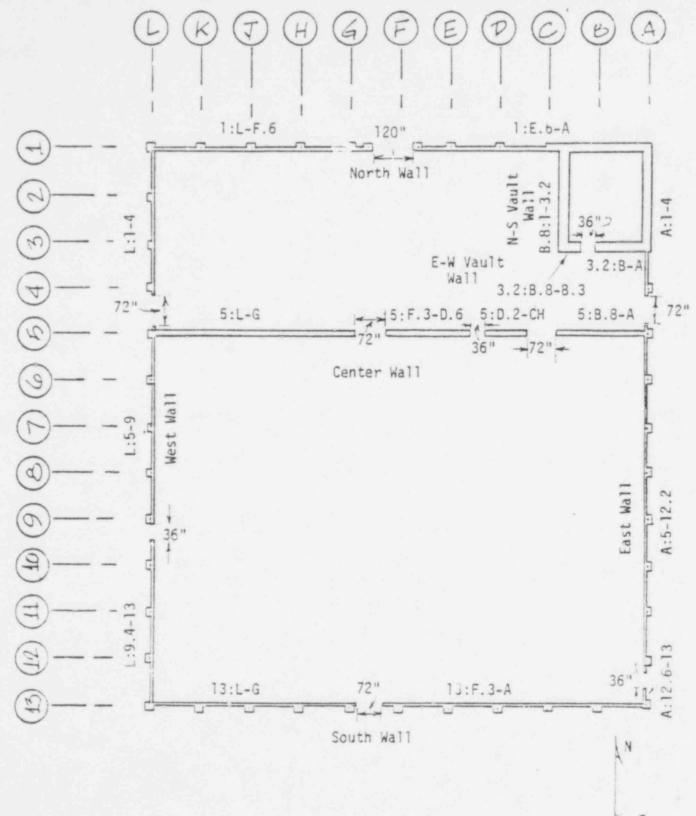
(a). 1st. STORY STRUCTURAL WALL ELEMENTS
